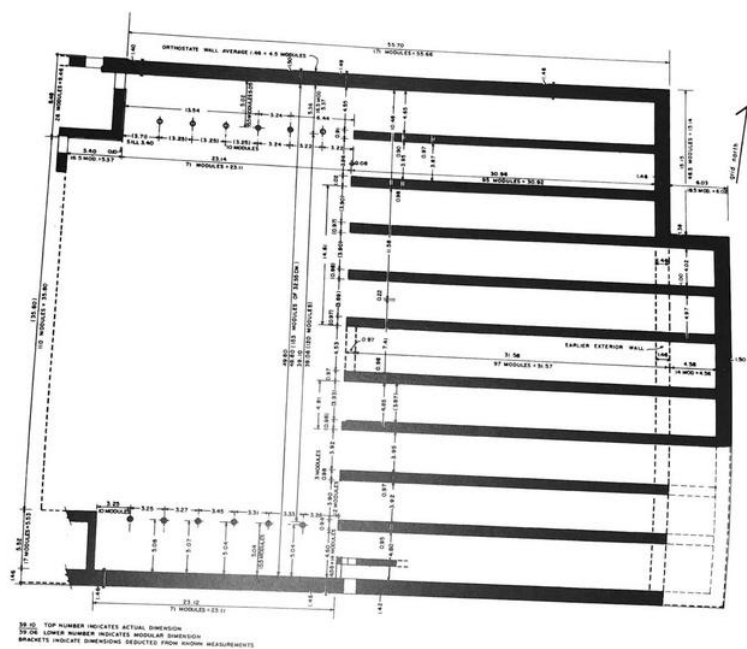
Restored plan of building T. Shaw and Shaw 1990: 958.
